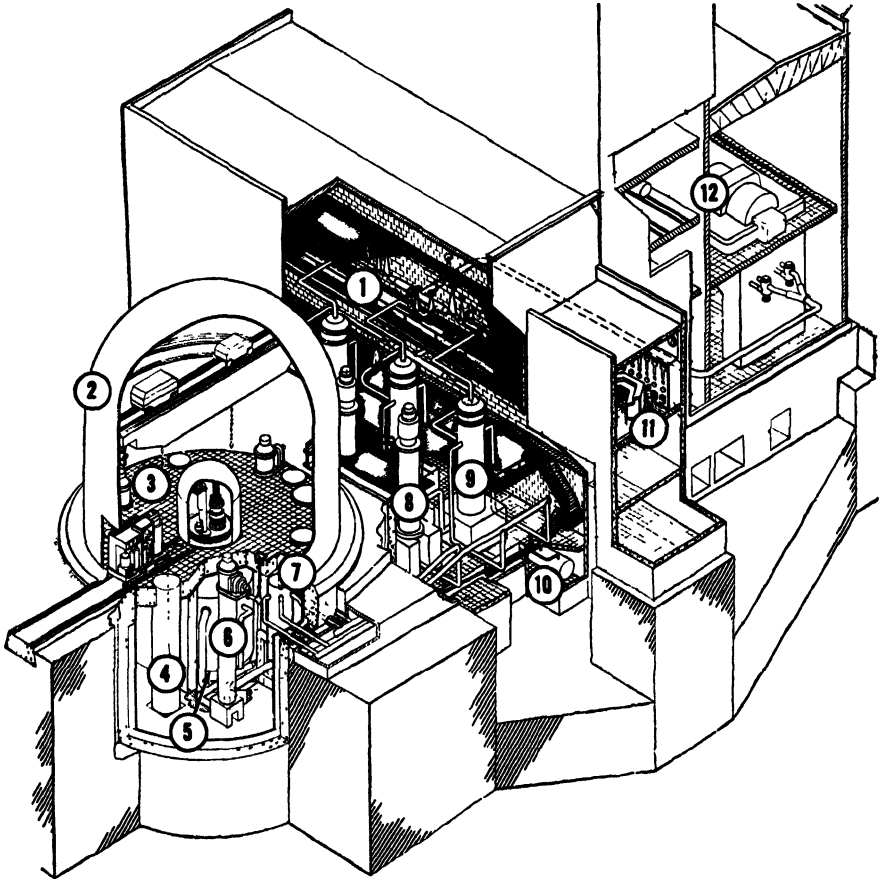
Cutaway drawing of reactor and steam-electric buildings, showing location of major equipment. 1. Steam generator house; 2. Gastight building; 3. Transfer cask car; 4. Primary sodium overflow tank; 5. Reactor; 6. Primary sodium pump; 7. Intermediate heat exchanger; 8. Secondary sodium pump; 9. Steam generator; 10. Secondary sodium dump tank; 11. Control room; 12. Turbogenerator.
